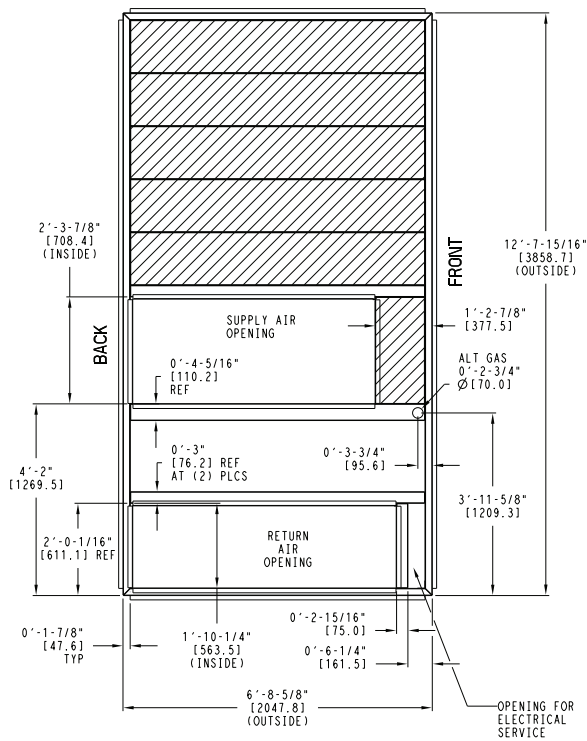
Roof Curb Details – 17 and 20 Size Units
